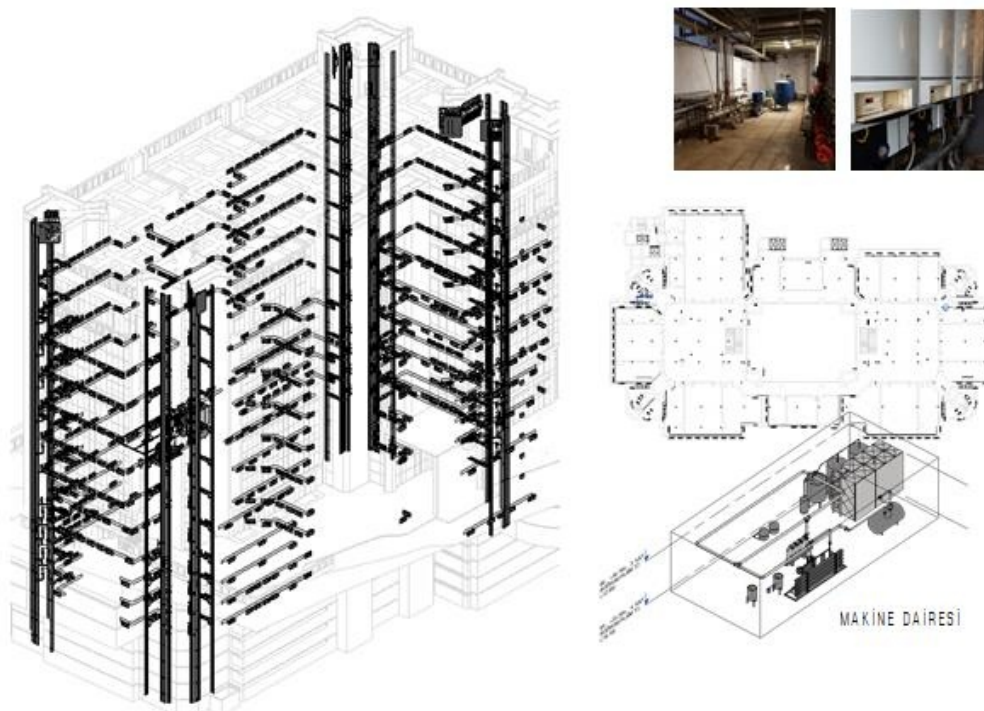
MSGSU Bomonti building Electro-Mechanical (MEP) As-Built BIM models
